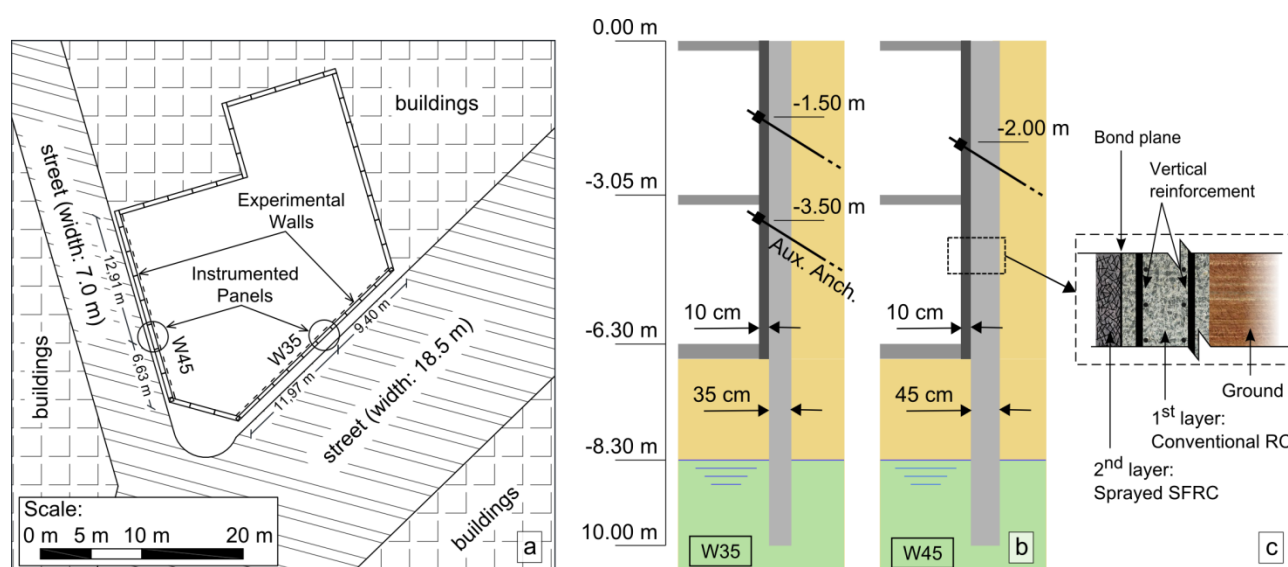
Experimental building: (a) site plan; (b) general cross-section; (c) detail of bi-layer cross-section.
